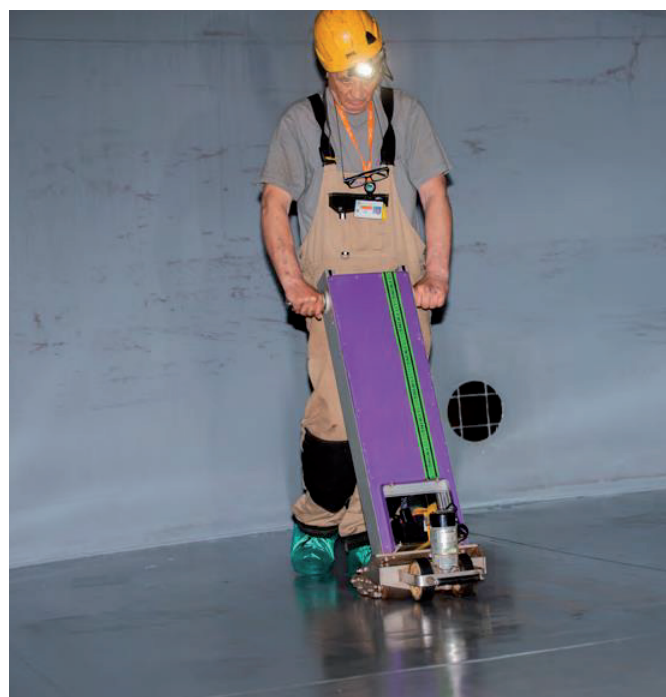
Inspection of bottom plates using MFL detection scanner.
